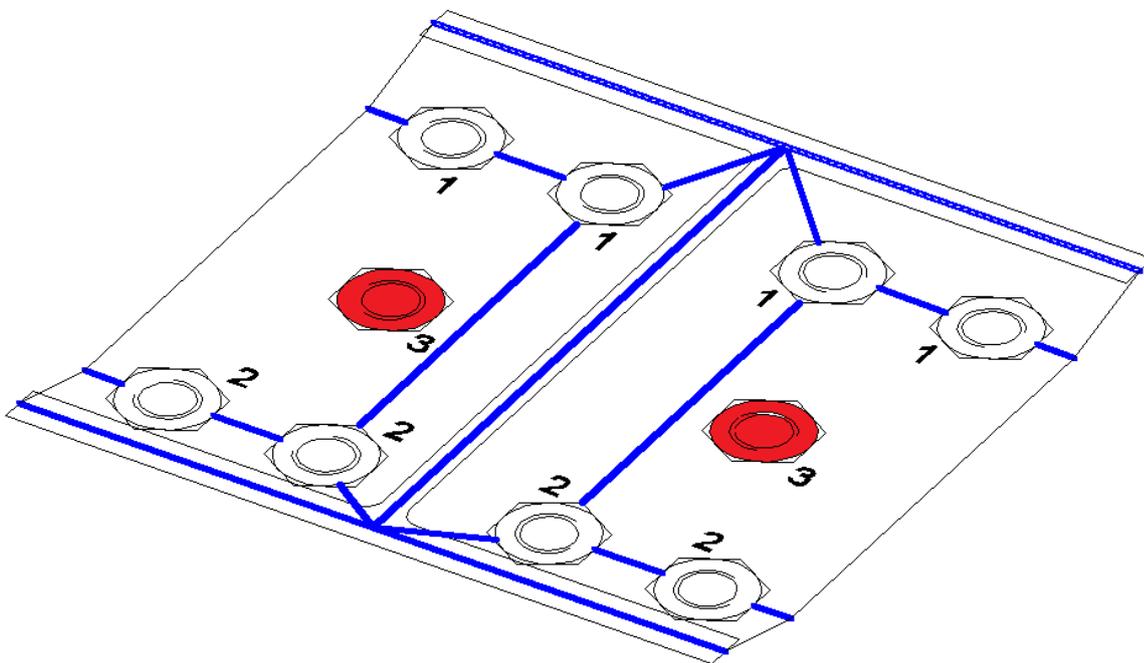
Truss bottom chord is connected with end plates and bolts which are in between steel beam flanges. The quantity and sizes of bolts are not sufficient for massive steel beam section. Bolts should also be placed outside of flanges (see figure 5 for example)
